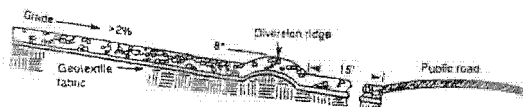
Cross-section of a Construction Entrance/Exit (NC, 1993)
